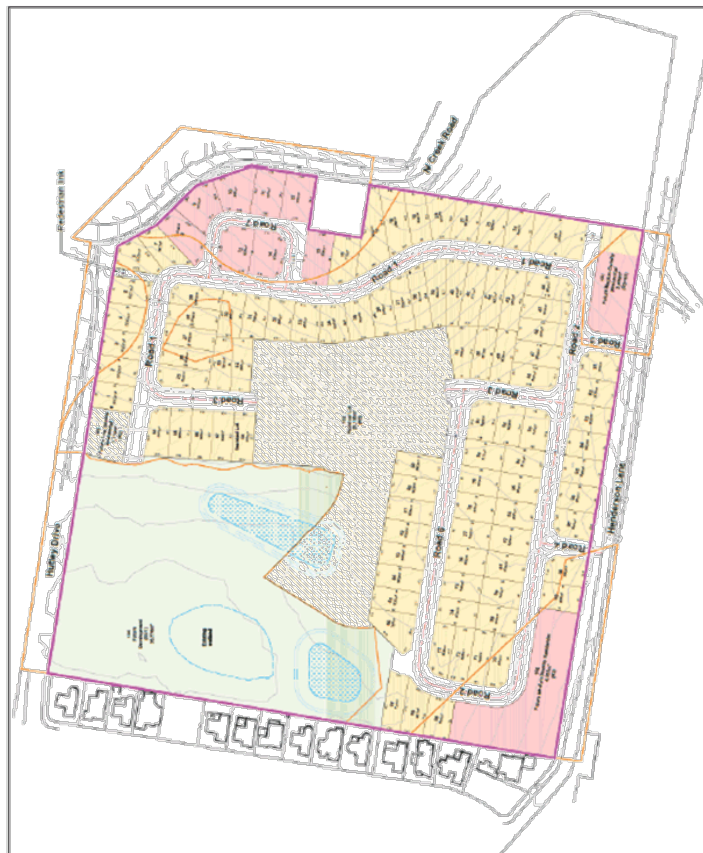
Proposed Subdivision Plan (February 2020) – see also Attachment 2
